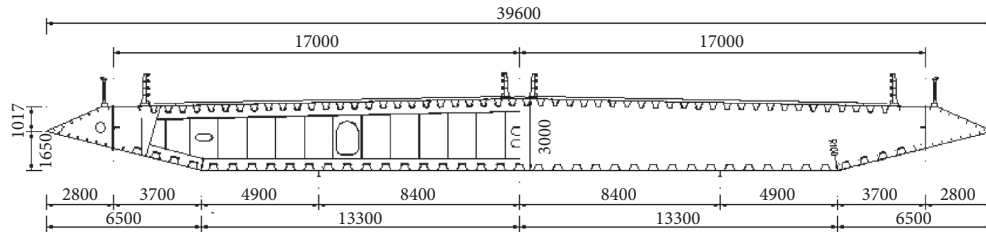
Standard cross section of steel box girder (unit: mm).
